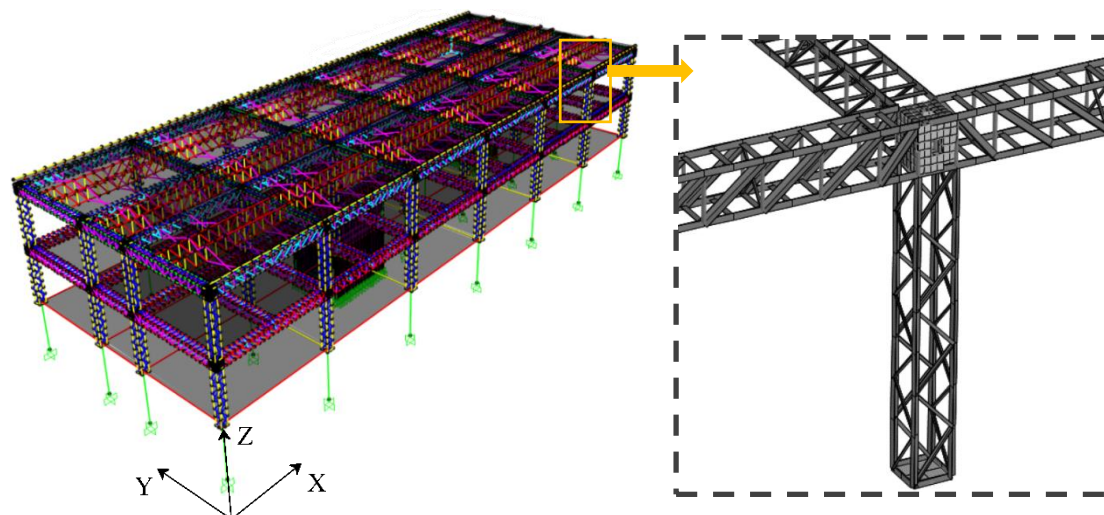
View of the finite element model of the structure and detail of a steel beam-to-column joint.
